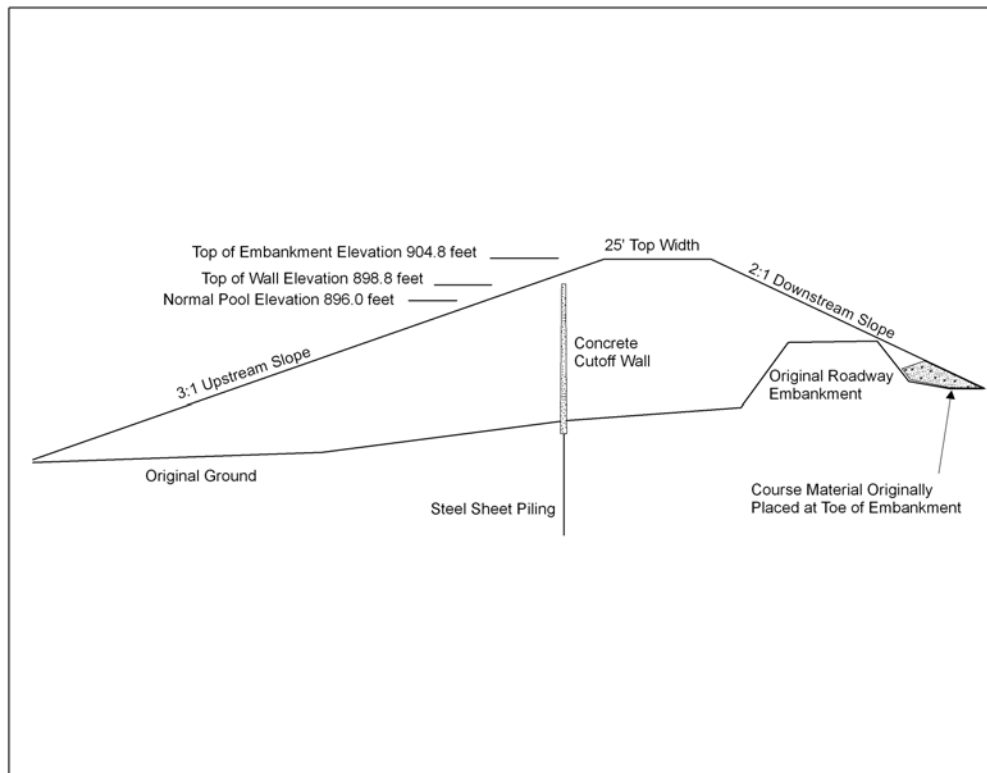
Typical Embankment Section. Source: Iowa DNR based on original design plans provided by LDRA.
